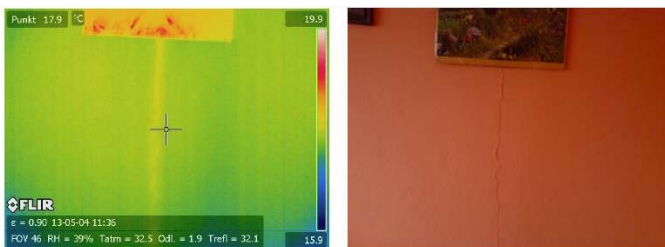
Thermal bridge formed in the place of vertical connection of prefabricated units of the so called concrete panel units W-70 [10]
